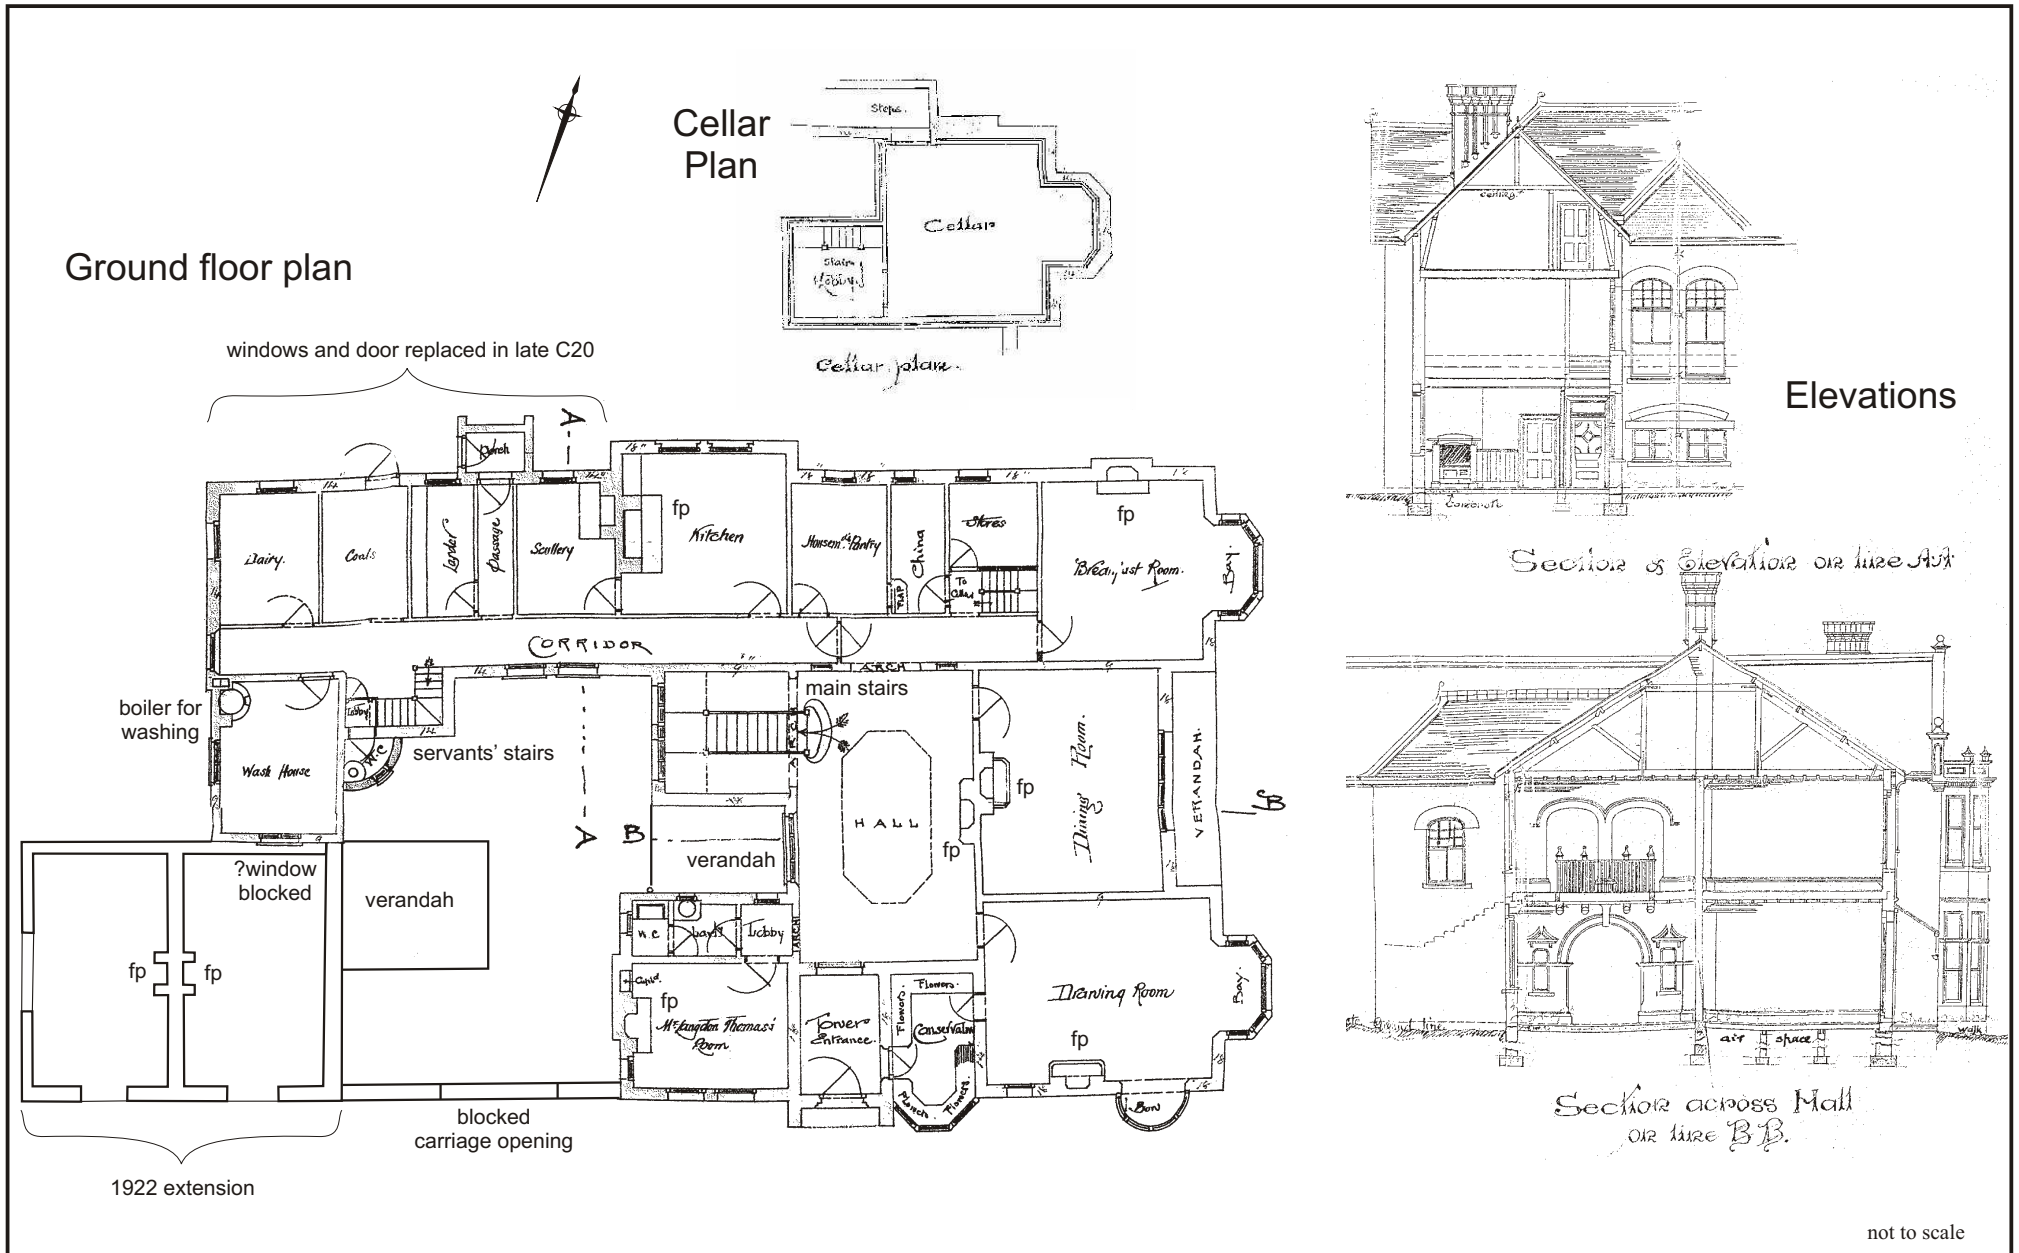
Plans and sections of Crossmead Hall, drawn in 1893 by James Crocker, FRIBA. Reproduced by courtesy of Exeter City Council Building Control Department (Reference ST 1/1893). Further details have been added based on photographs by D. Lewis.
